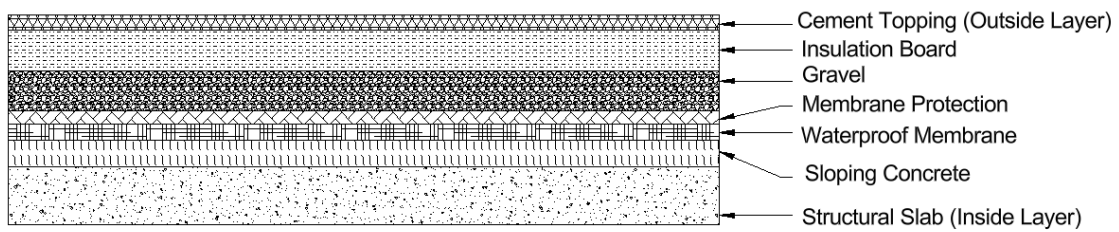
The Construction Design for the Montpetit Hall Exterior Floor
